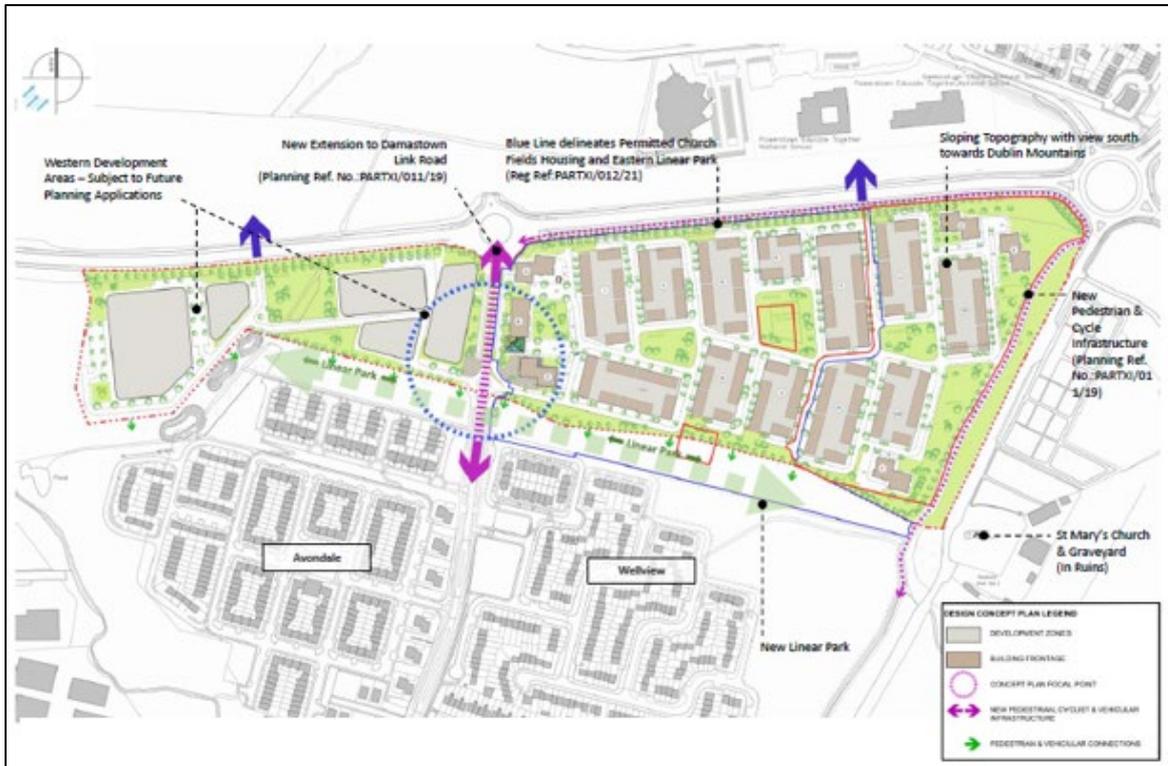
Church Fields Design Concept Plan (Source: Walsh Associates 2023).
